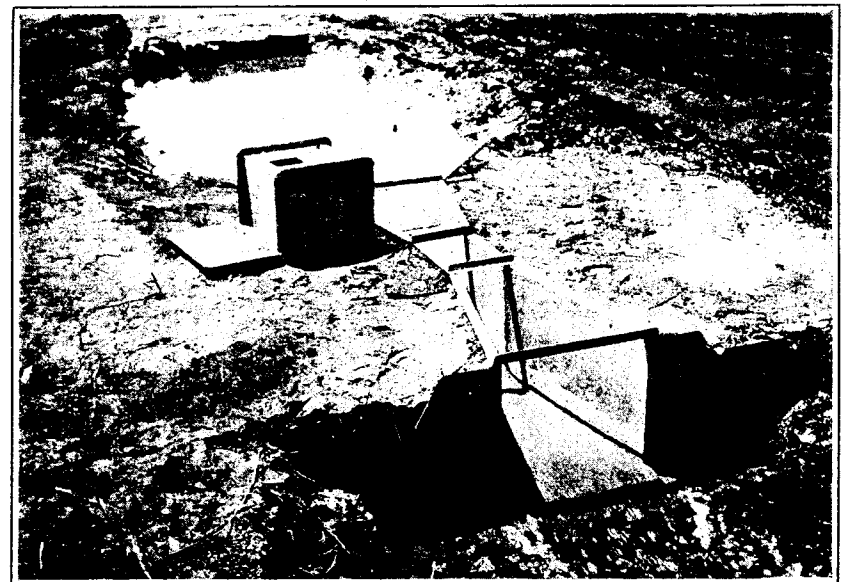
Six-inch Parshall measuring flume constructed of sheet metal. Typical field installation on farm lateral.
